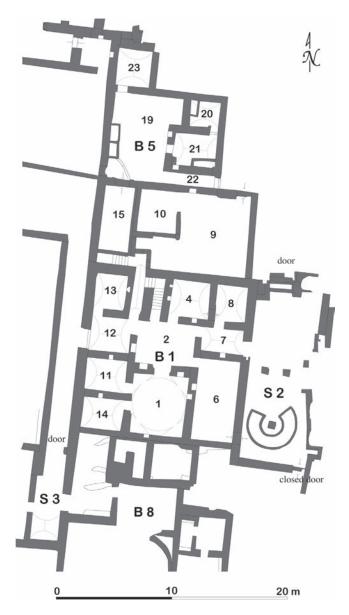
Plan of Serenos's house (B1) with streets (S2 and S3) and annexed building to the north. (Courtesy of NYU Excavations at Amheida.)
